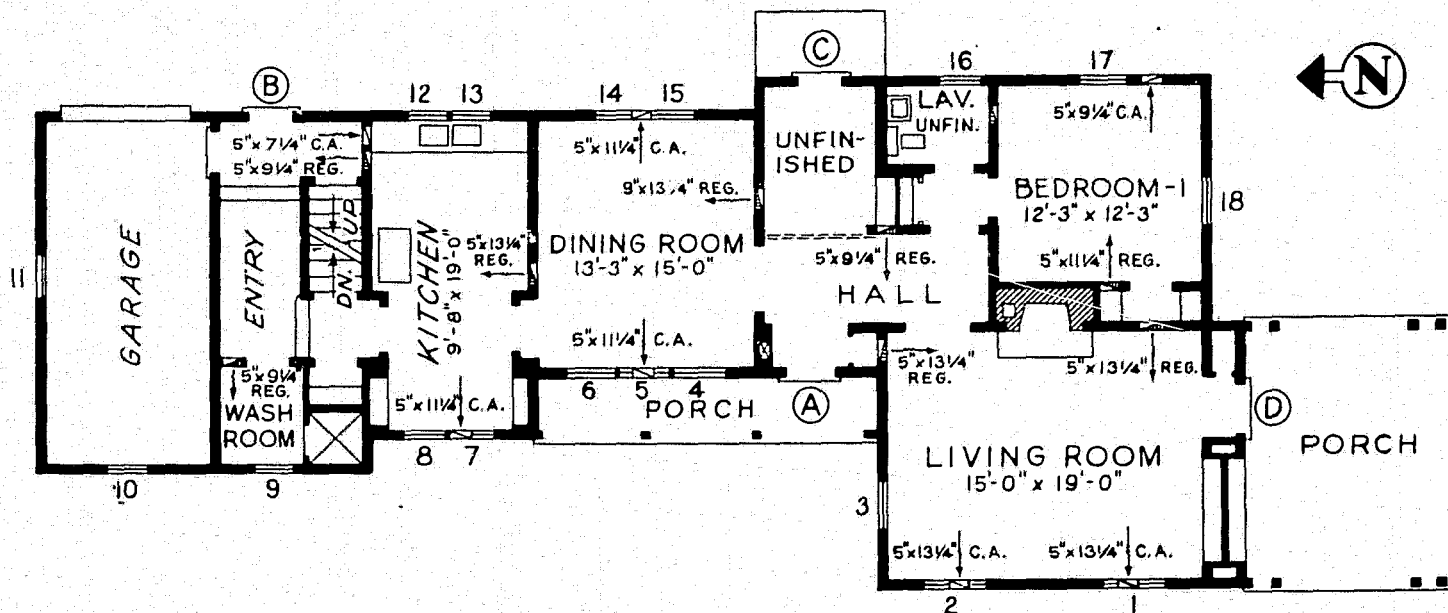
First-floor plan of house No. 7-R, showing location of warm-air registers and cold-air returns.
